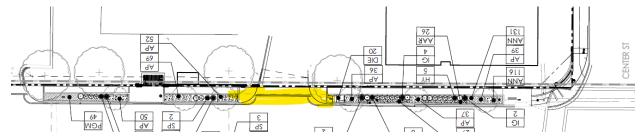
Existing conditions showing gap in planters for parking lot entrance.
